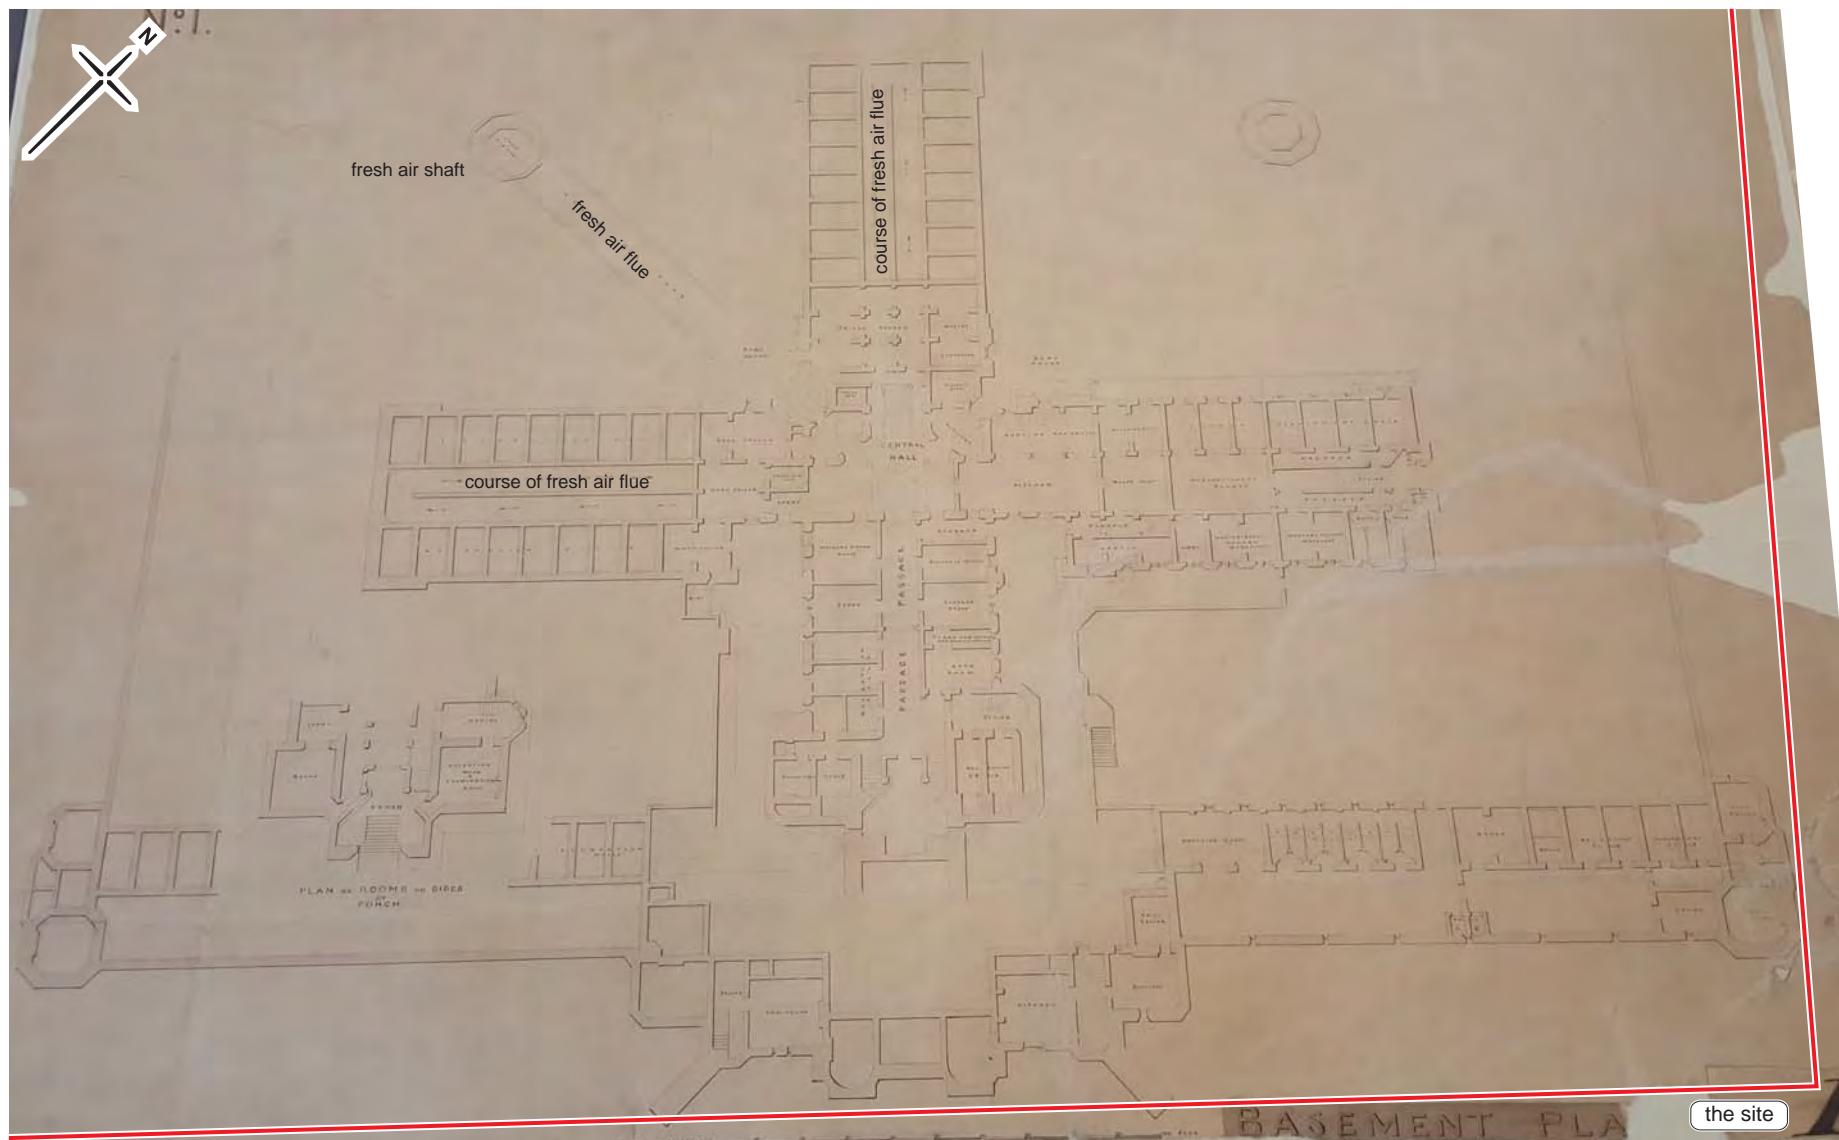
Basement Plan of the Prison c 1847 (LMA COL/SVD/PLI/08/0554)
